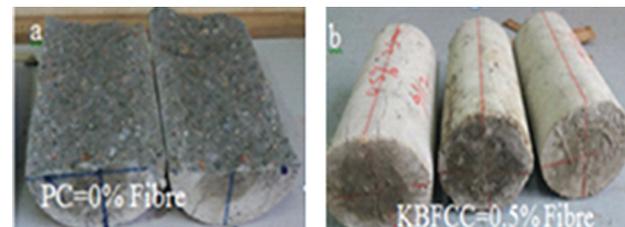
Failure mode of cylindrical specimen in indirect splitting tensile (a) PC specimen, (b) KBFCC specimen.
